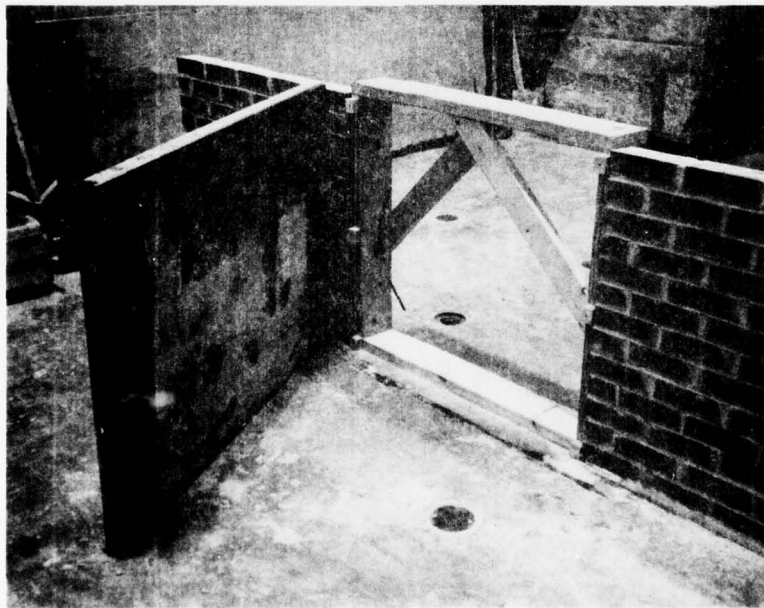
A restraining frame placed between the brick walls from which the closure can be pulled against the walls by springs
